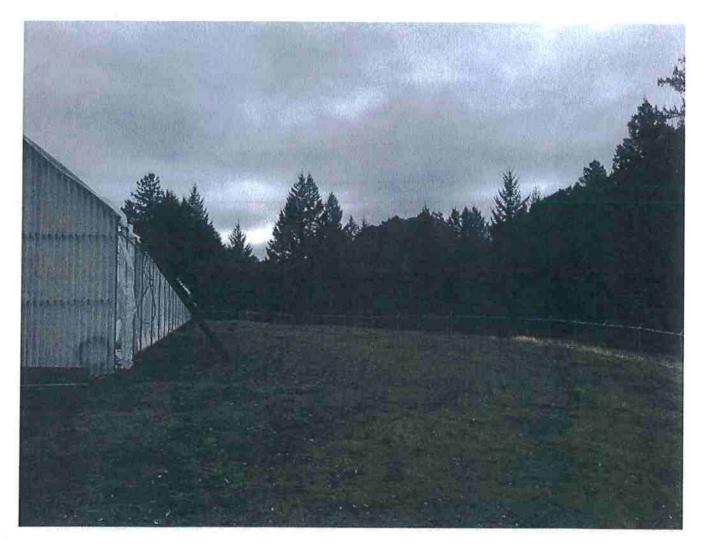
Cultivation site proposed for relocation. Note cut-slope failures above the site, and fill-slope erosion and debris torrent below the site. Photo date 3-1-2019.
